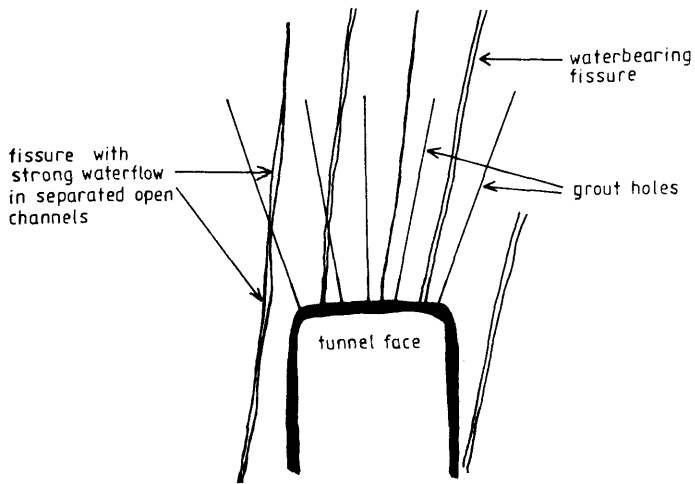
Conventional grouting with fissures parallel to the drift. When the grout holes are conventionally placed and directed the chances to obtain a good sealing of the fissures are small
